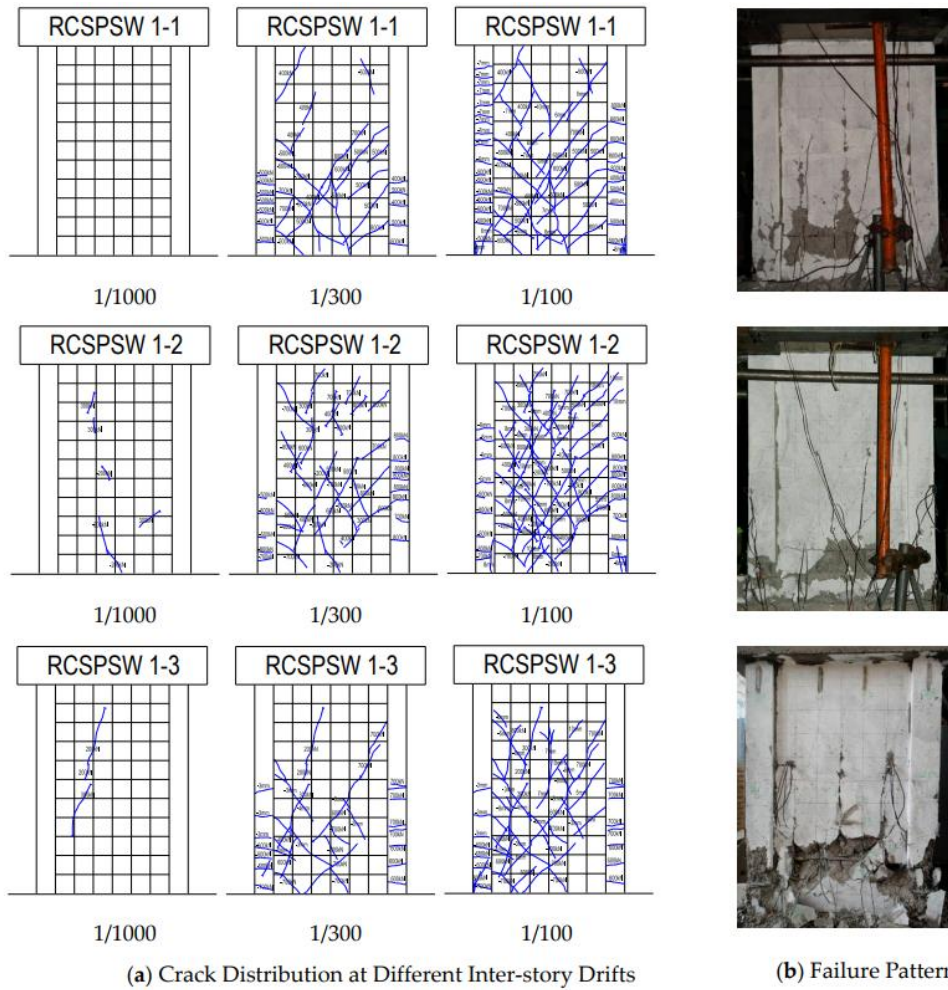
Crack patterns and failure mode of CESP walls that failed in shear (Ziang et al. 2019)
